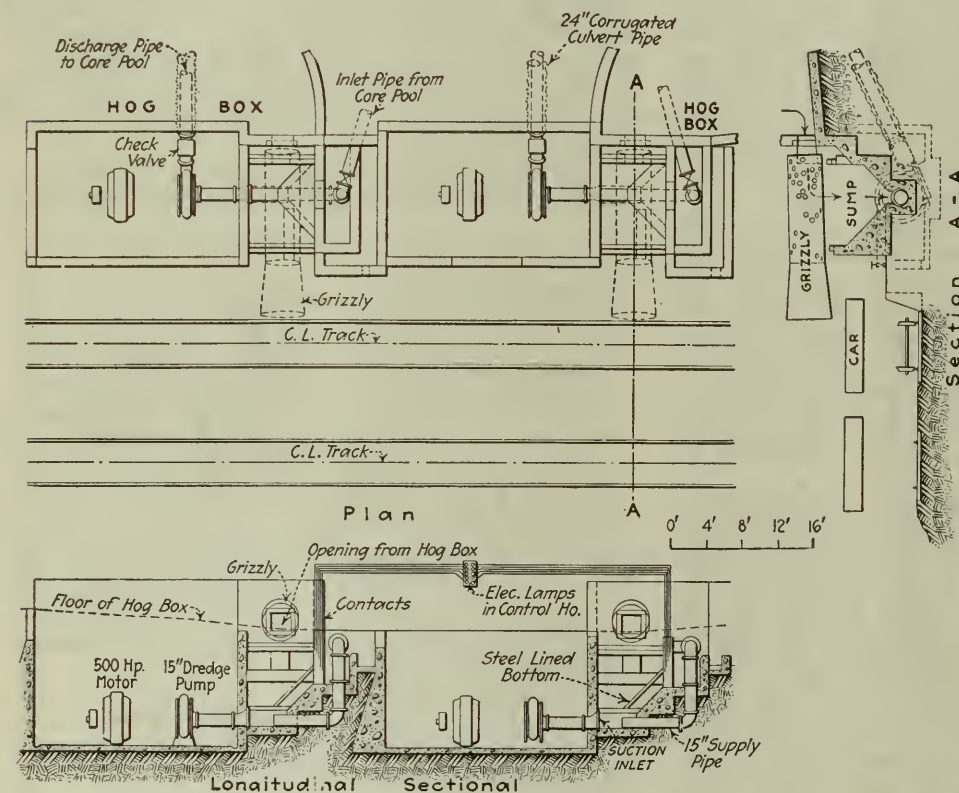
IMPROVED SUMP PLACES PUMPS UNDER PRESSURE
